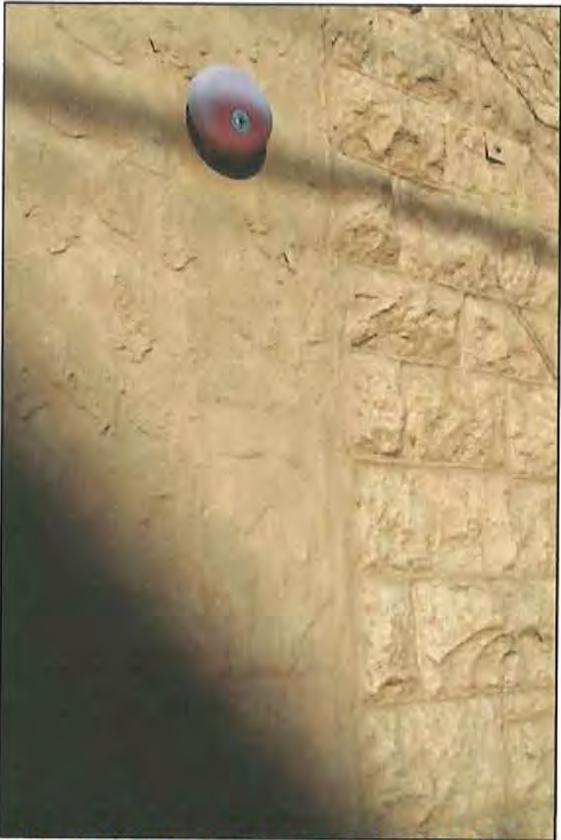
East elevation, junction of 1938 addition with 1902 original building.
